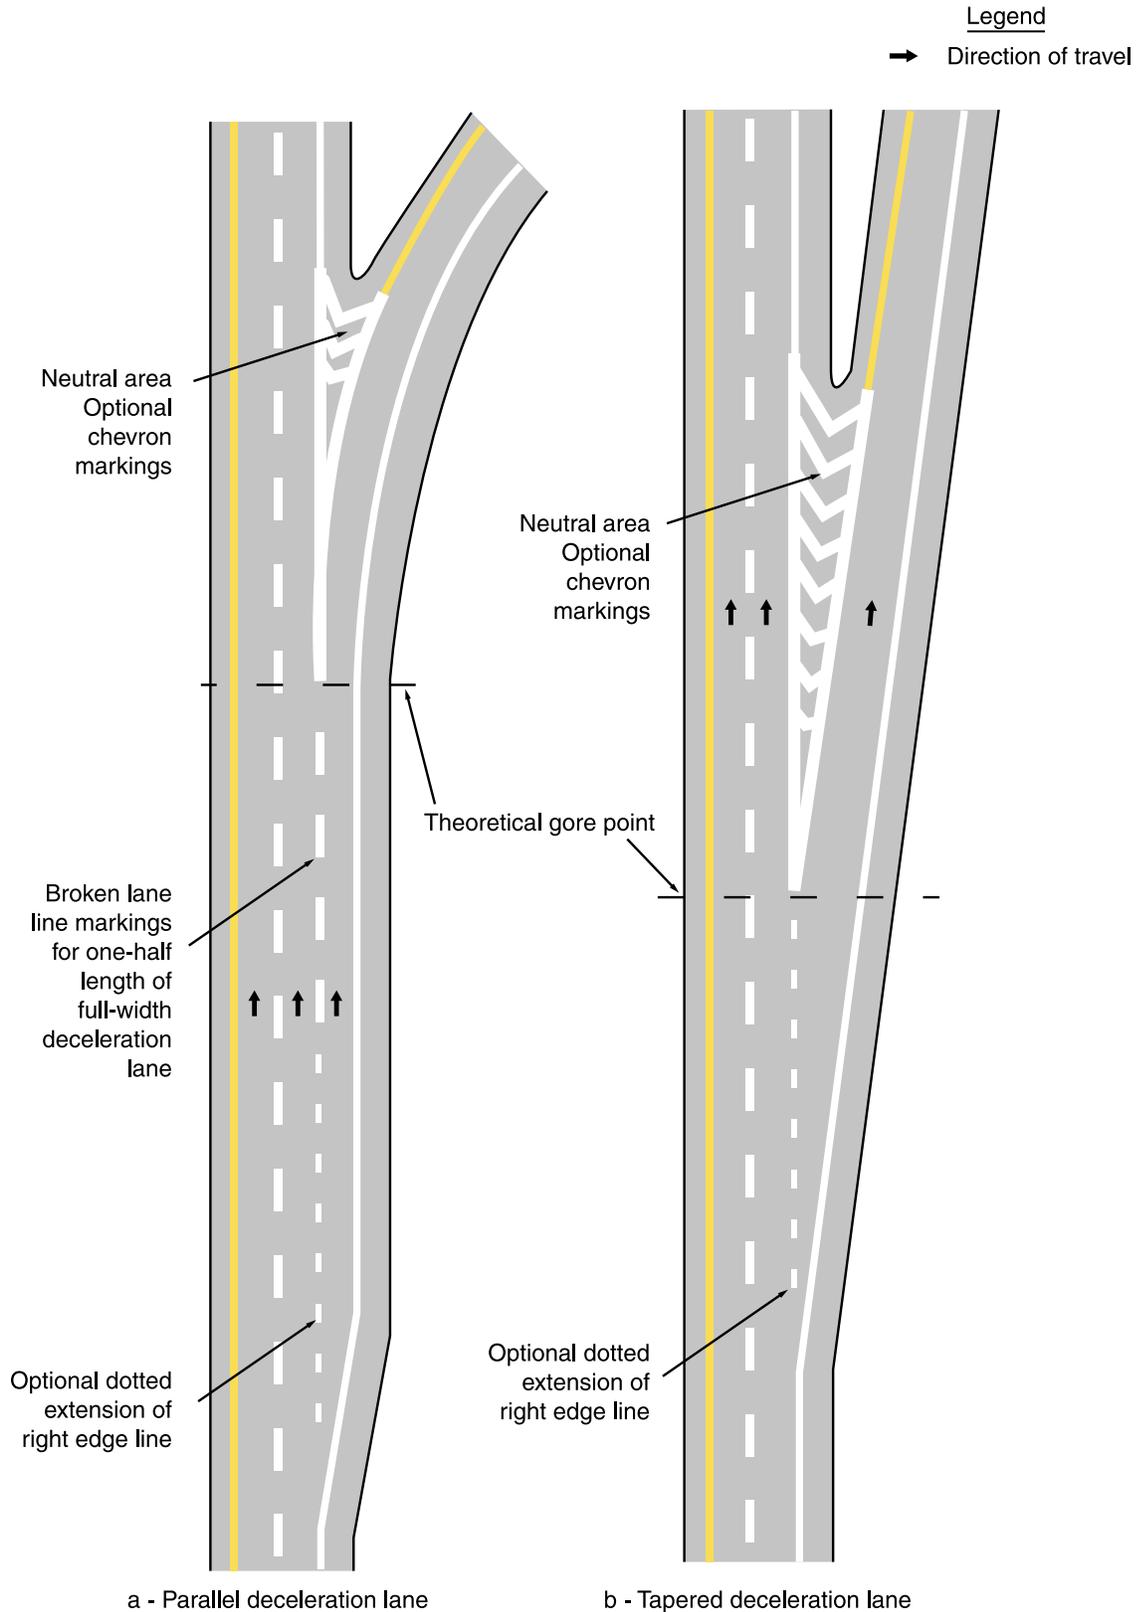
B-8. Typical Exit Ramp and Cloverleaf Ramp Markings (Sheet 2 of 2)
